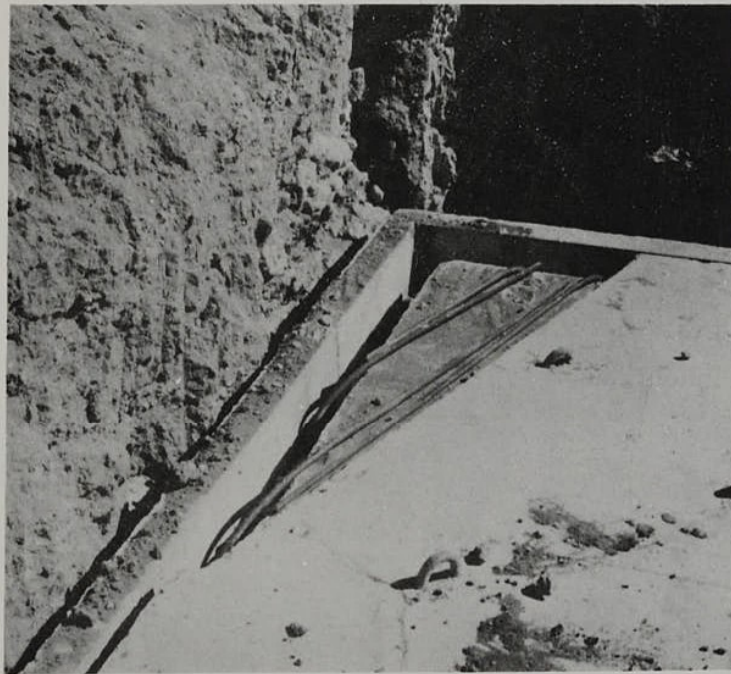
DETAIL OF CORNER OF FULL SIZE SLAB
